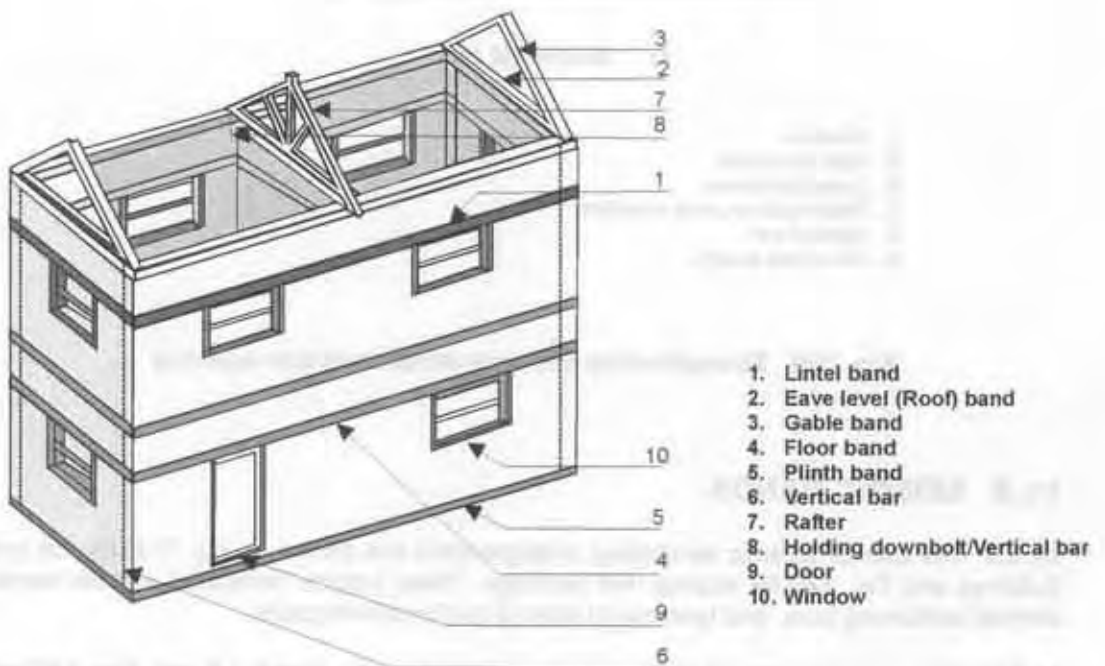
B Overall arrangement of reinforcing in masonry double storey building having pitched roofs
